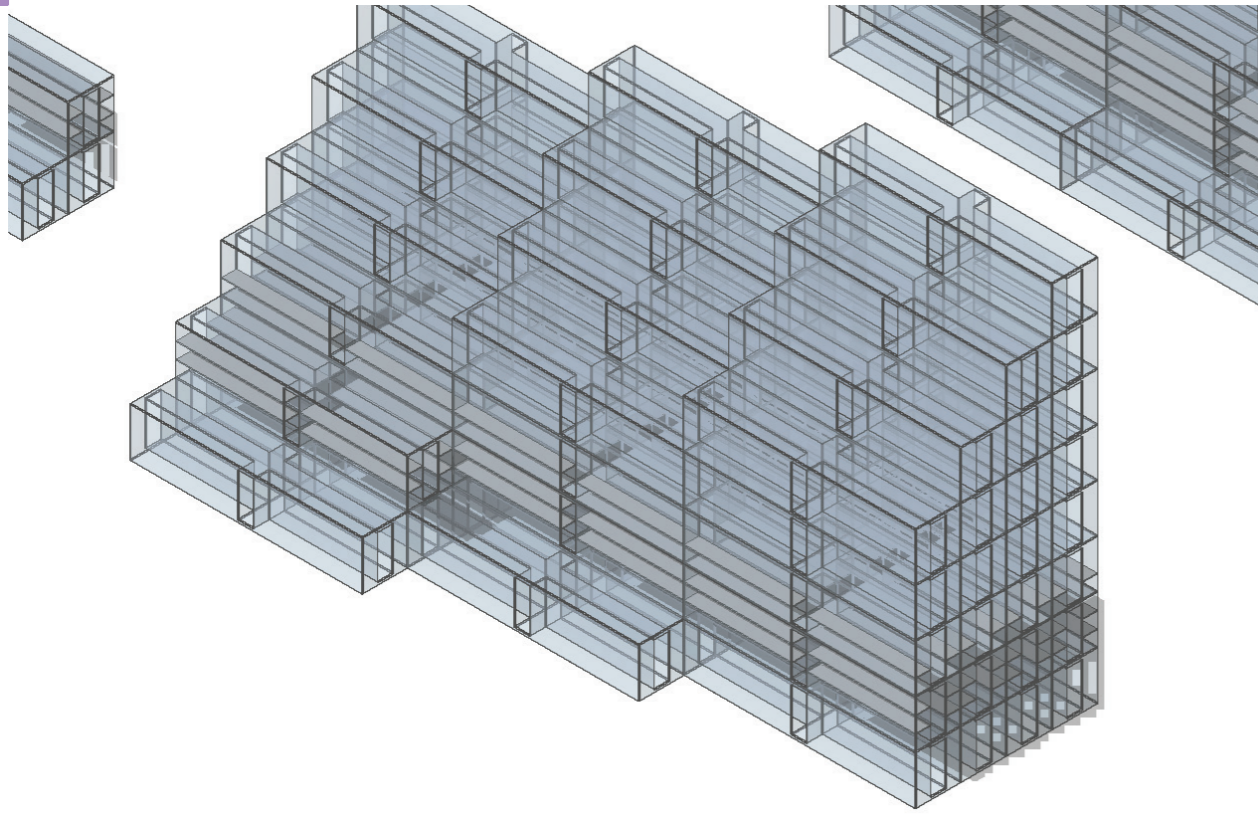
First analytical models to study the daylight access to the containers floor plan (By author)
